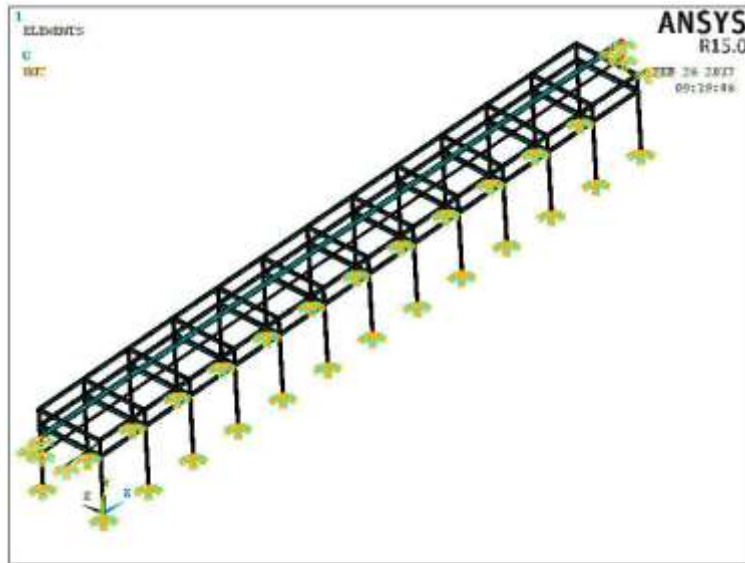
Steel pipe supporting structure with span lengths 4 meter and pipes 70-102-159-324 located on it.
